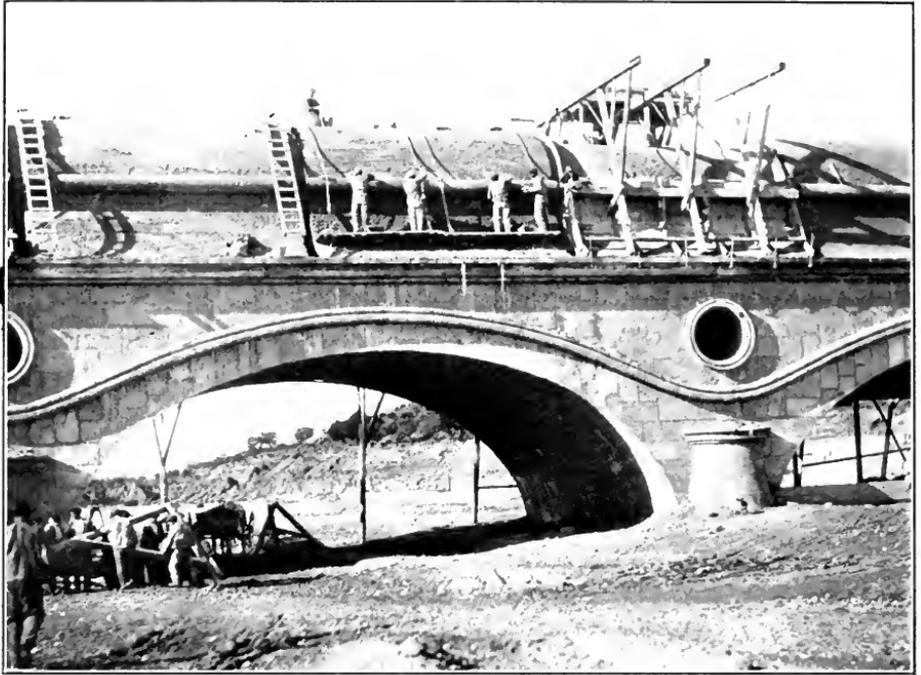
FIG. C.—Construction of concrete shell around steel tubes on bridge. Sosa Siphon, Spain.
